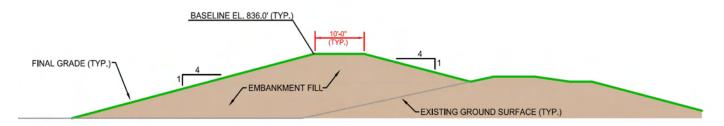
Fort Loudoun Dam - Earthen Embankment Concept for Segment FTL-4
